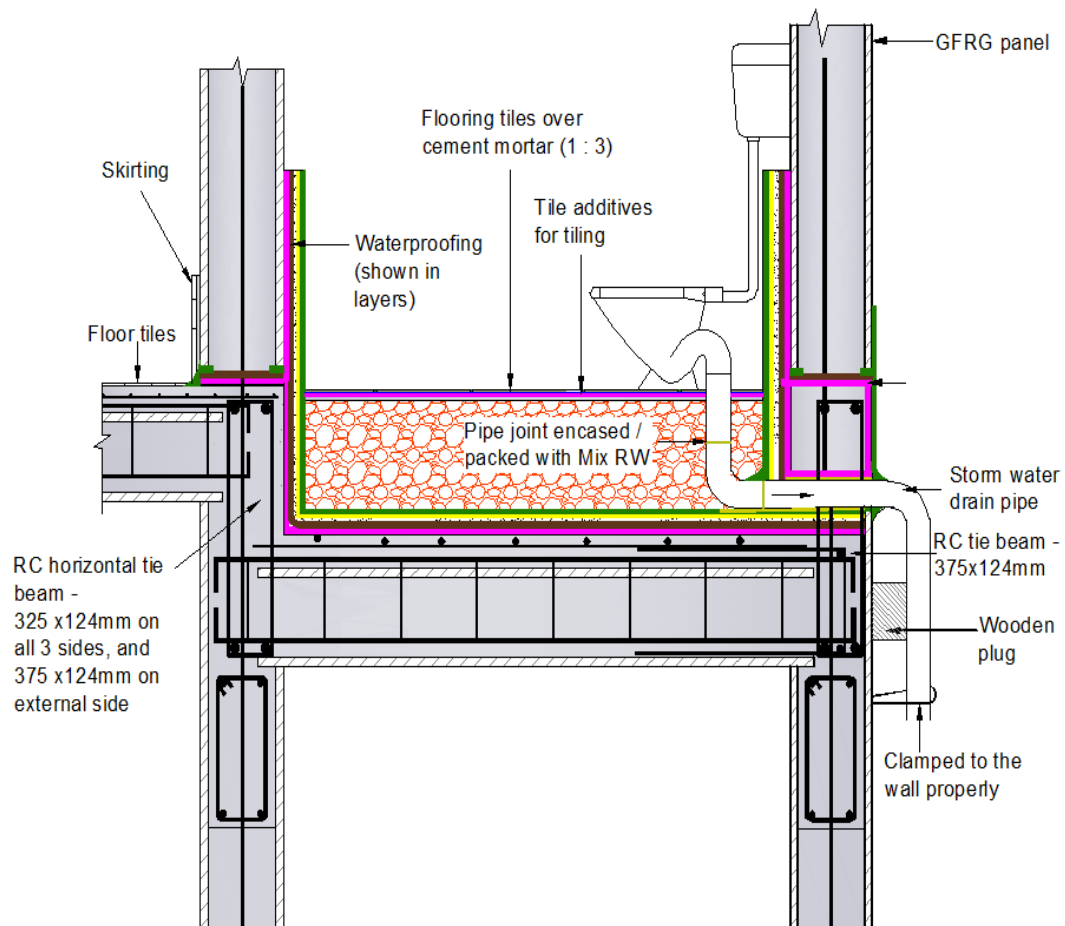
Sunken floor for bathroom / toilet (with 200mm level difference)
